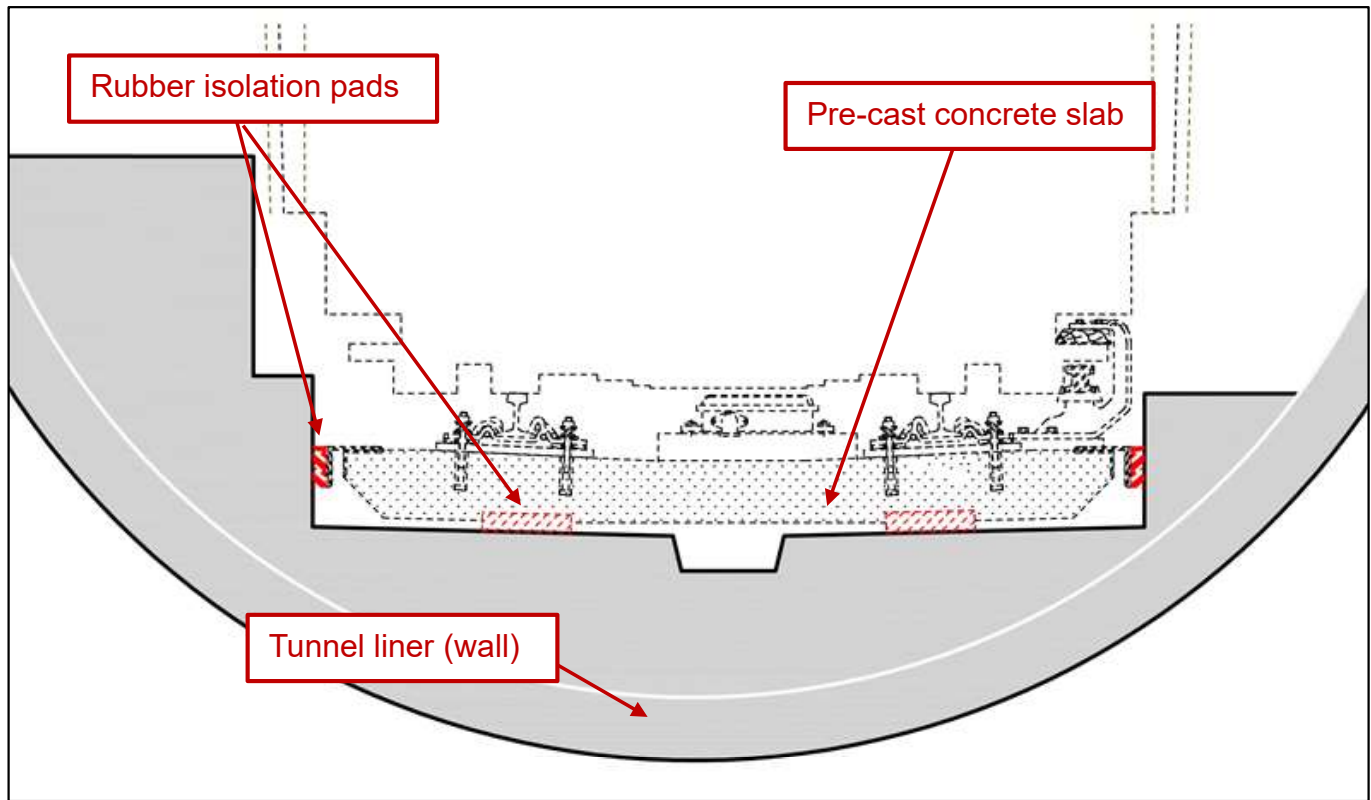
Cross-Section of TTC Floating Slab Track
